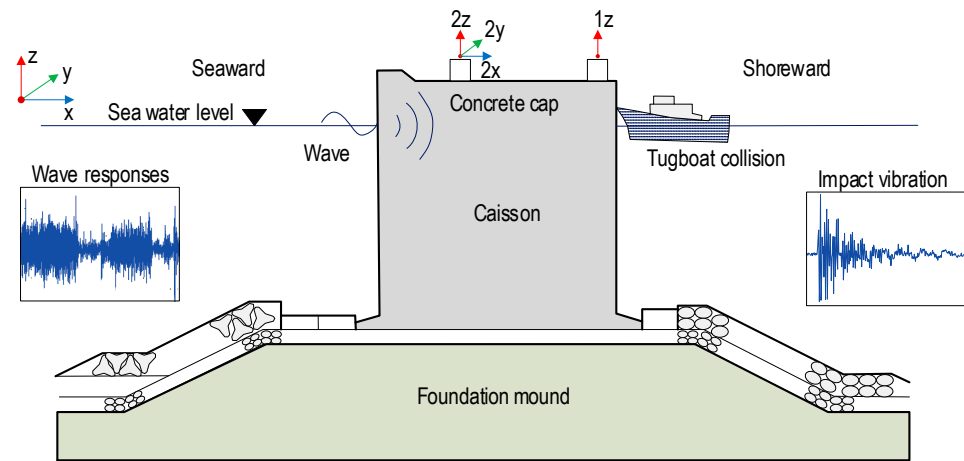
Vibration monitoring setup on a submerged caisson-foundation system.
